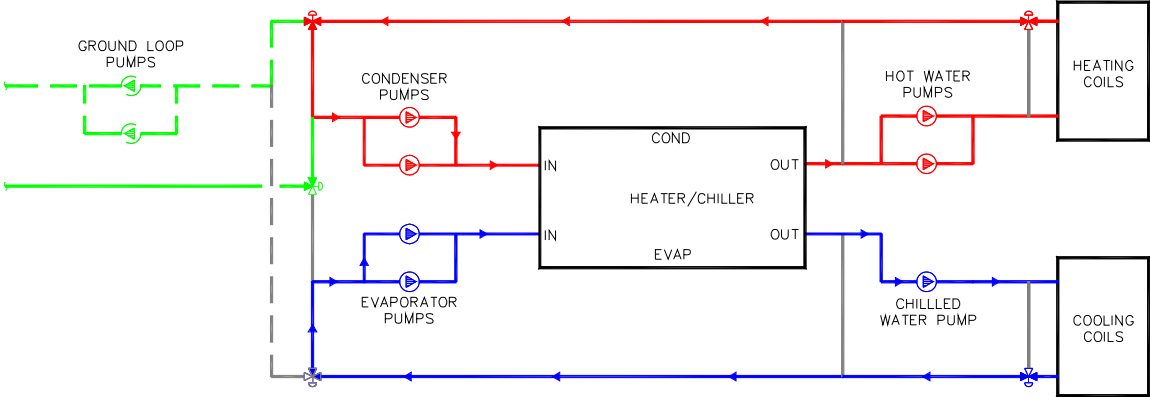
Central Geothermal Plant with Excess Cooling Load (Rejecting Heat to the Ground)
